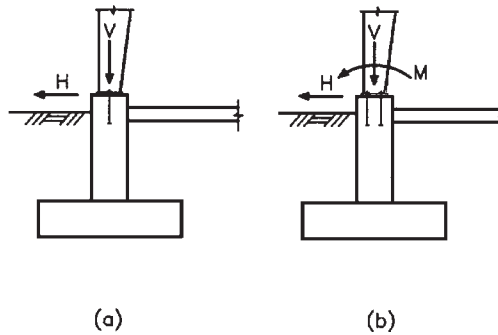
Forces acting on foundations supporting rigid-frame columns: (a) pin-base columns; (b) fixed-base columns.
